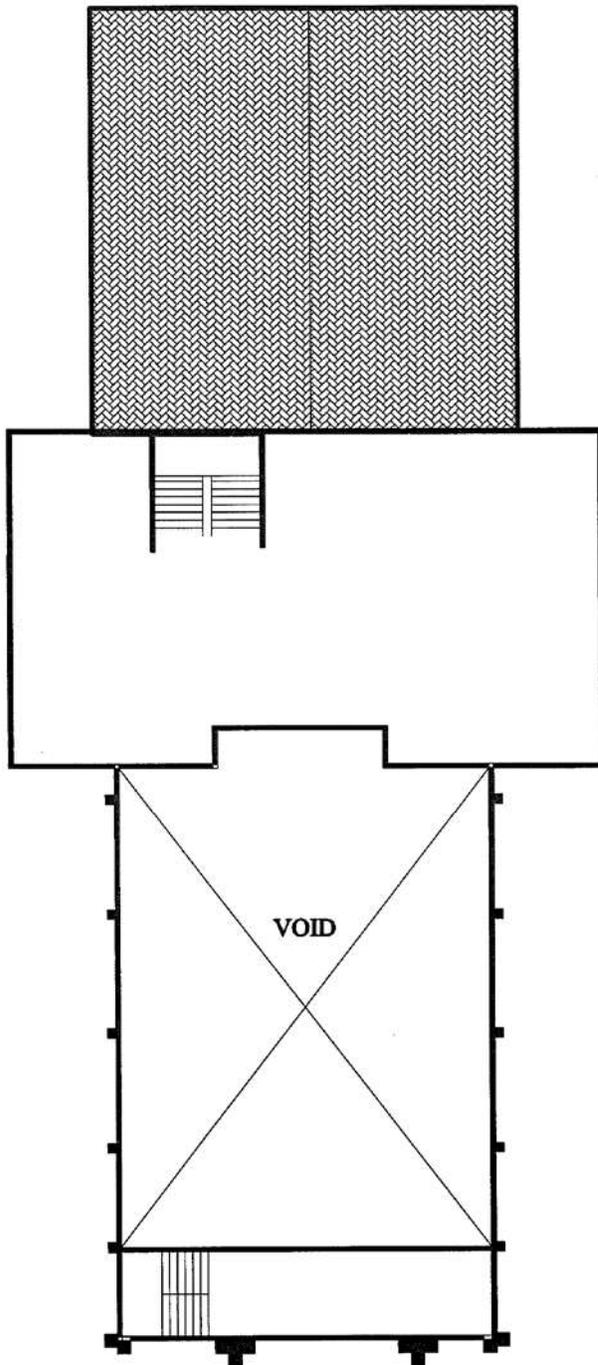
Figure F First Presbyterian Church. Third Floor Plan (Current. Not to scale).
